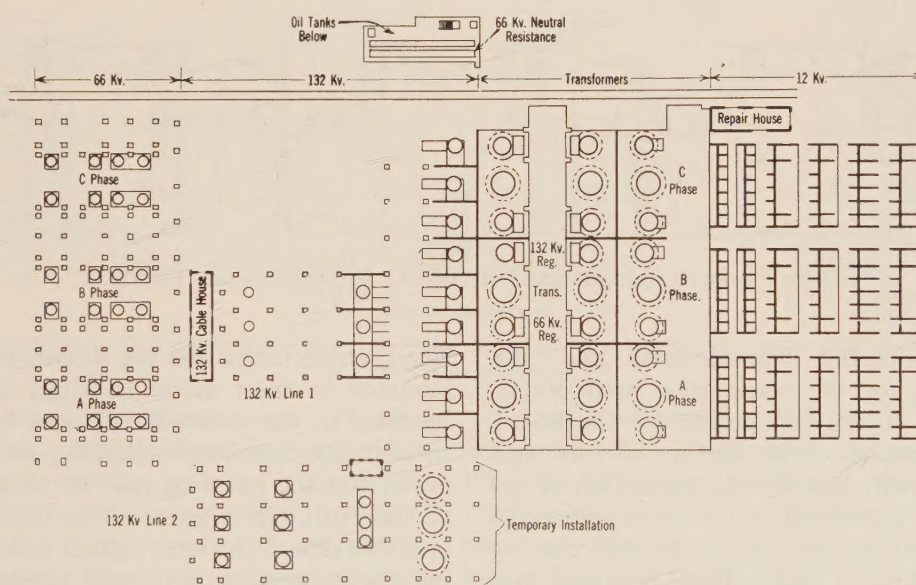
GENERAL ARRANGEMENT OF OUTDOOR TERMINAL
